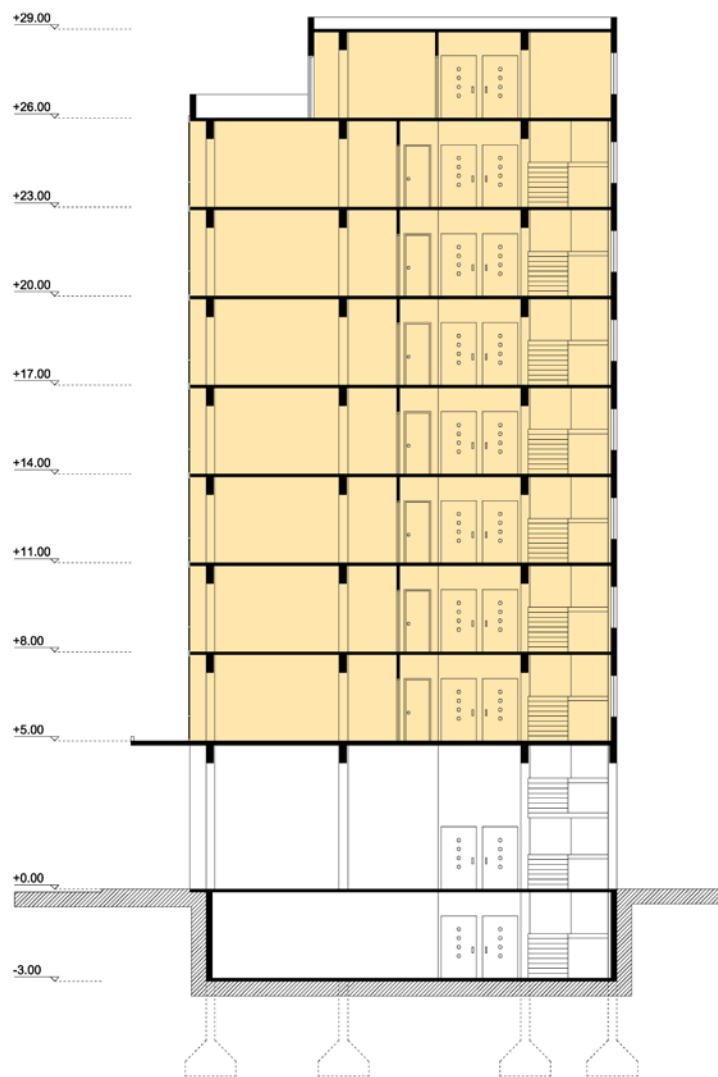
Cross section of our existing building example. We can see the commercial uses on the ground floor. The office space stretches out from the first to the 7th floor.
